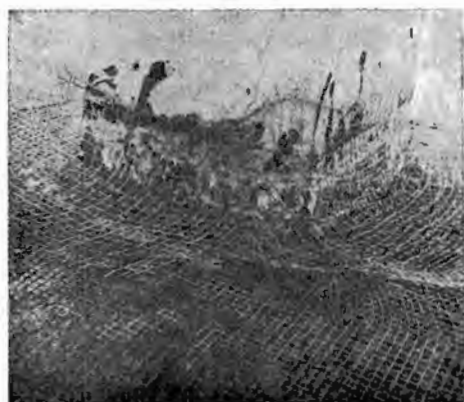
For intermediate columns, wiremesh from roof is taken over to columns for an effective waterproofing treatment.
